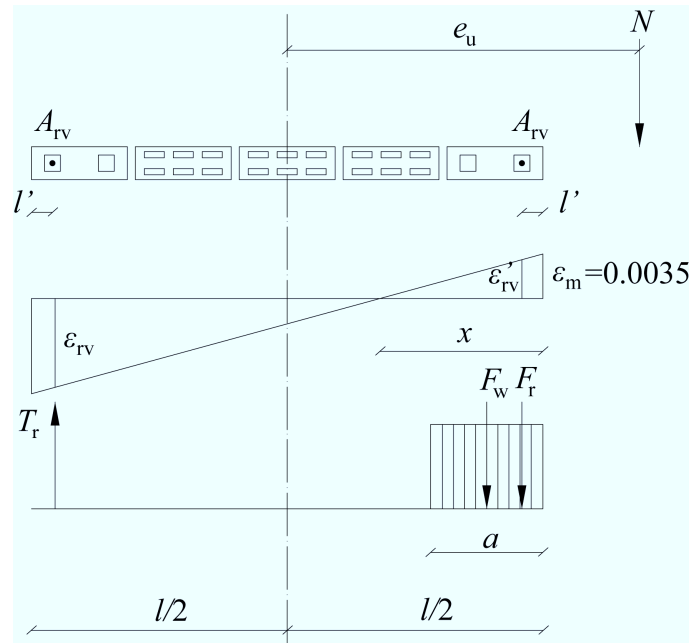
Equilibrium of sectional forces at flexural failure of reinforced masonry
